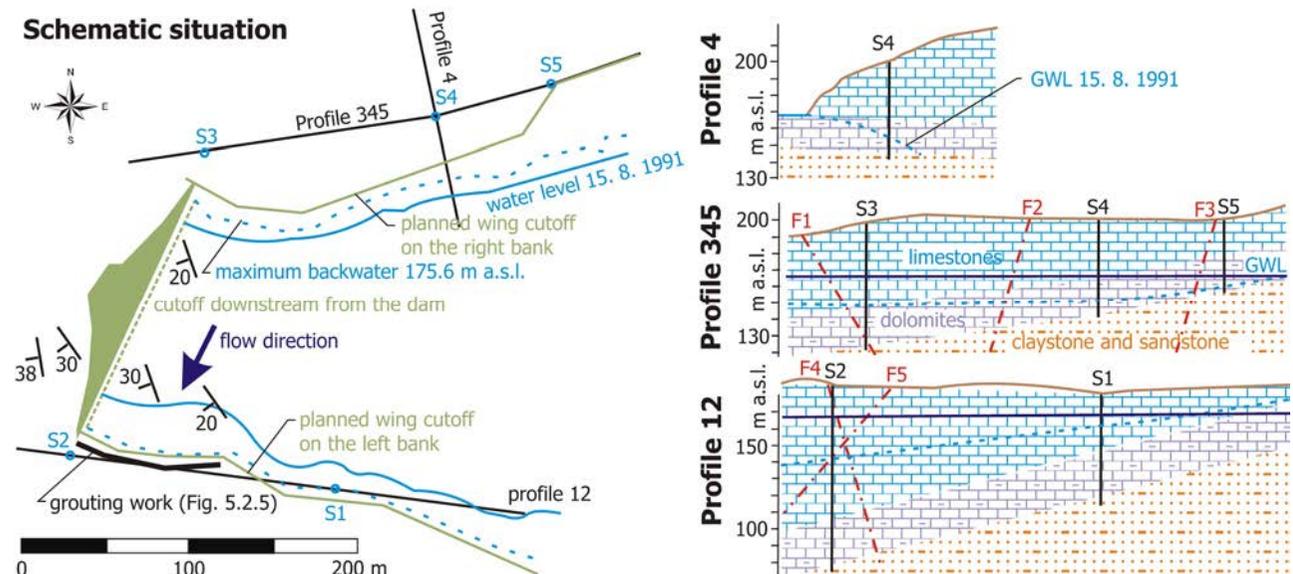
Plan and geological sections showing the layout of the Guiamets dam
